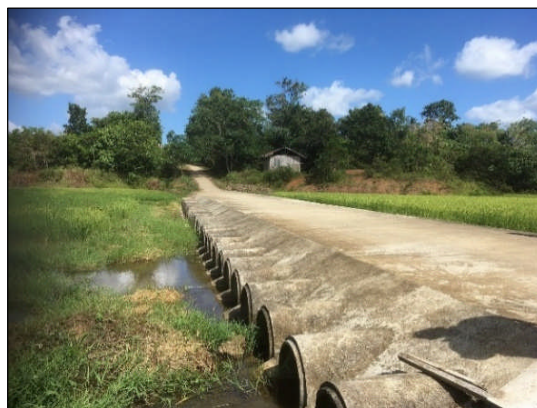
Farm to Market Access Road Constructed by This Project (Bohol Province)
